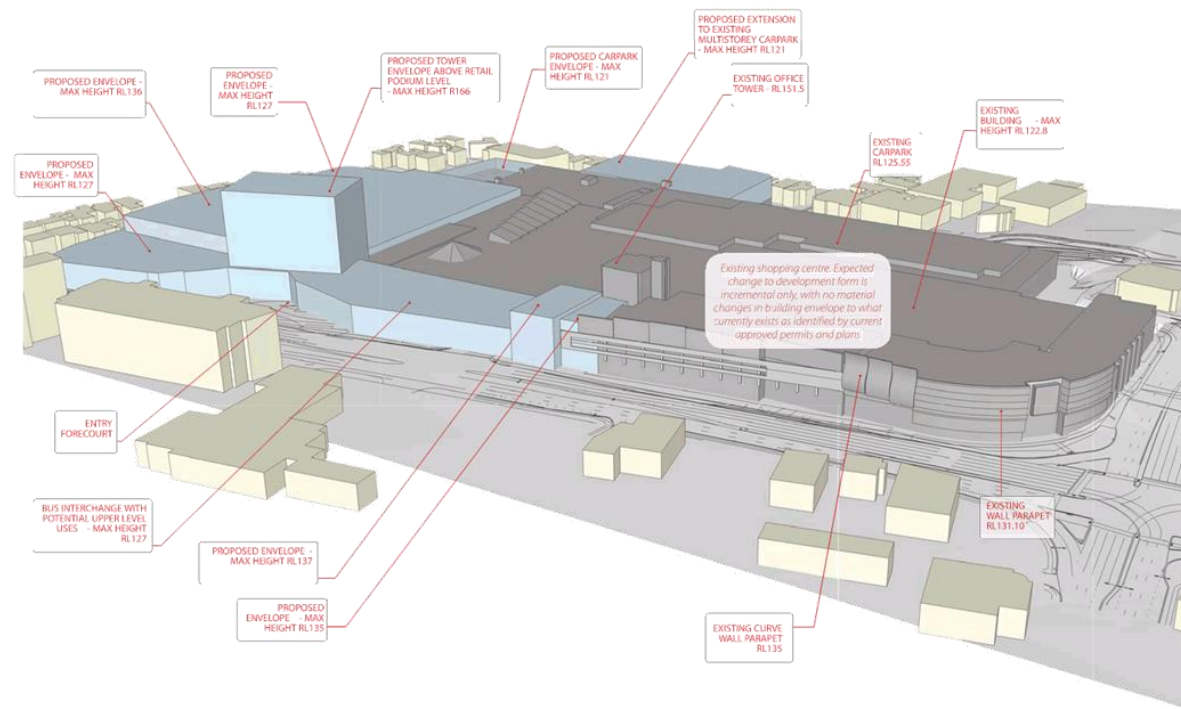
Perspective view of Indicative envelope plan, looking north-east across the site
